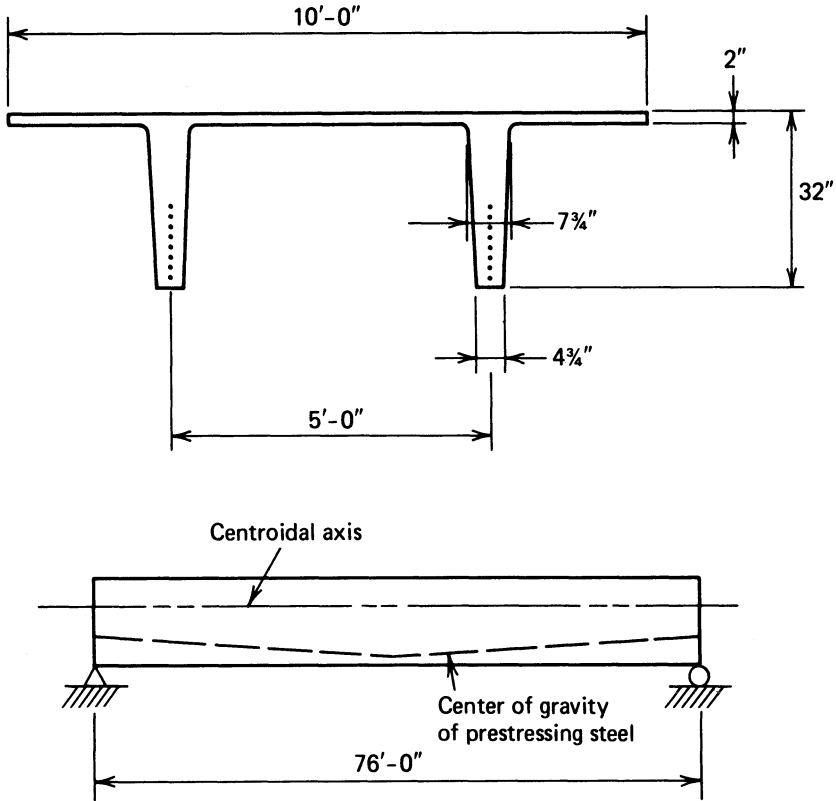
Double-tee beam used in Problem 1. (a) Cross section. (b) Elevation.
